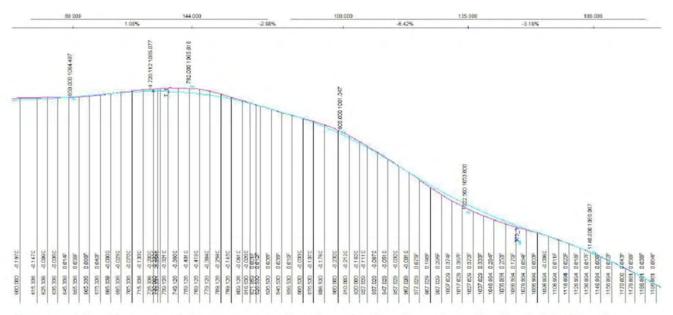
Extract of design centreline longitudinal section, Barleyfields Road
